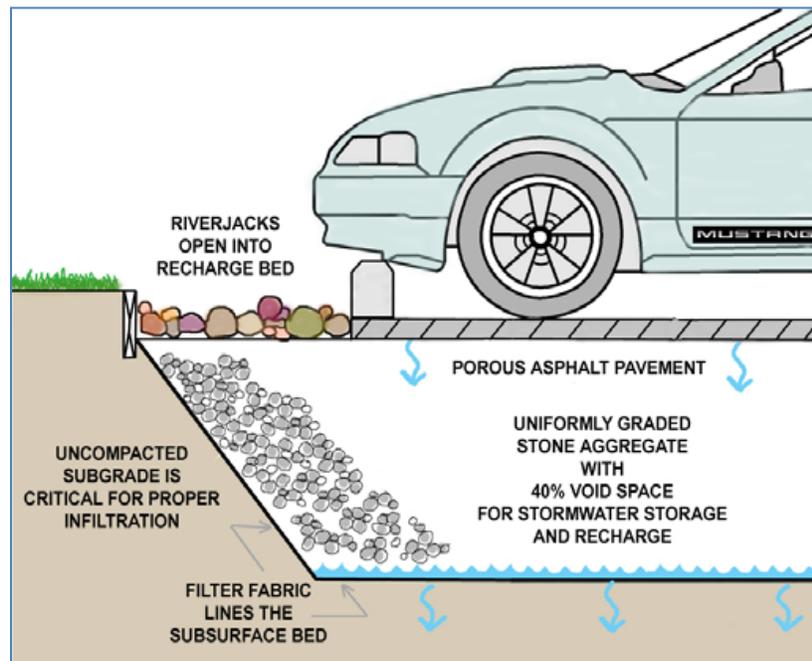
Permeable paver cross section (SCA Consulting Group, Lacey, WA).
